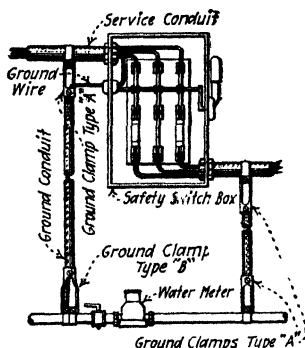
A neat method of grounding the conduit system and the neutral wire of the wiring system to a water pipe. The conduit protects the ground wire for the neutral and also serves as a ground conductor for the service conduit. The Type A connection has only one clamp, while the Type B connection has two clamps, one for the conduit ground and the other for the wire ground. The clamp can be obtained for $\frac{1}{2}$ to $1\frac{1}{4}$ -in. conduit and for pipe sizes of from $\frac{1}{2}$ to 6 in. The ground on the load side of the switch box is not required by the "Code." (Clamp made by *The Cowles Electric Co., New Britain, Conn.*)
